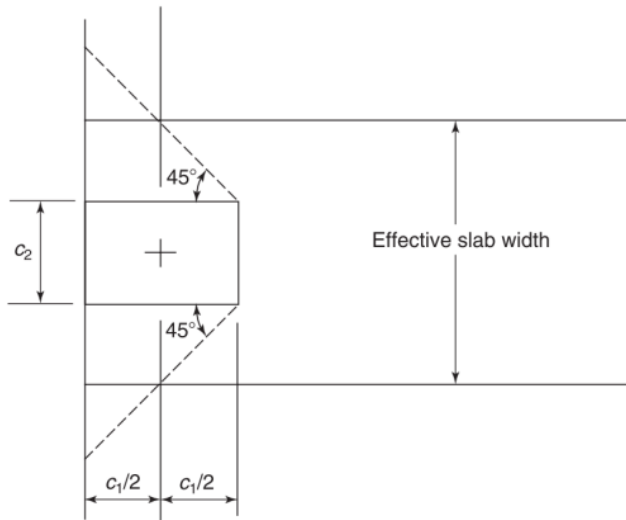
Minimum value for effective slab width at exterior slab-to-column connections.
